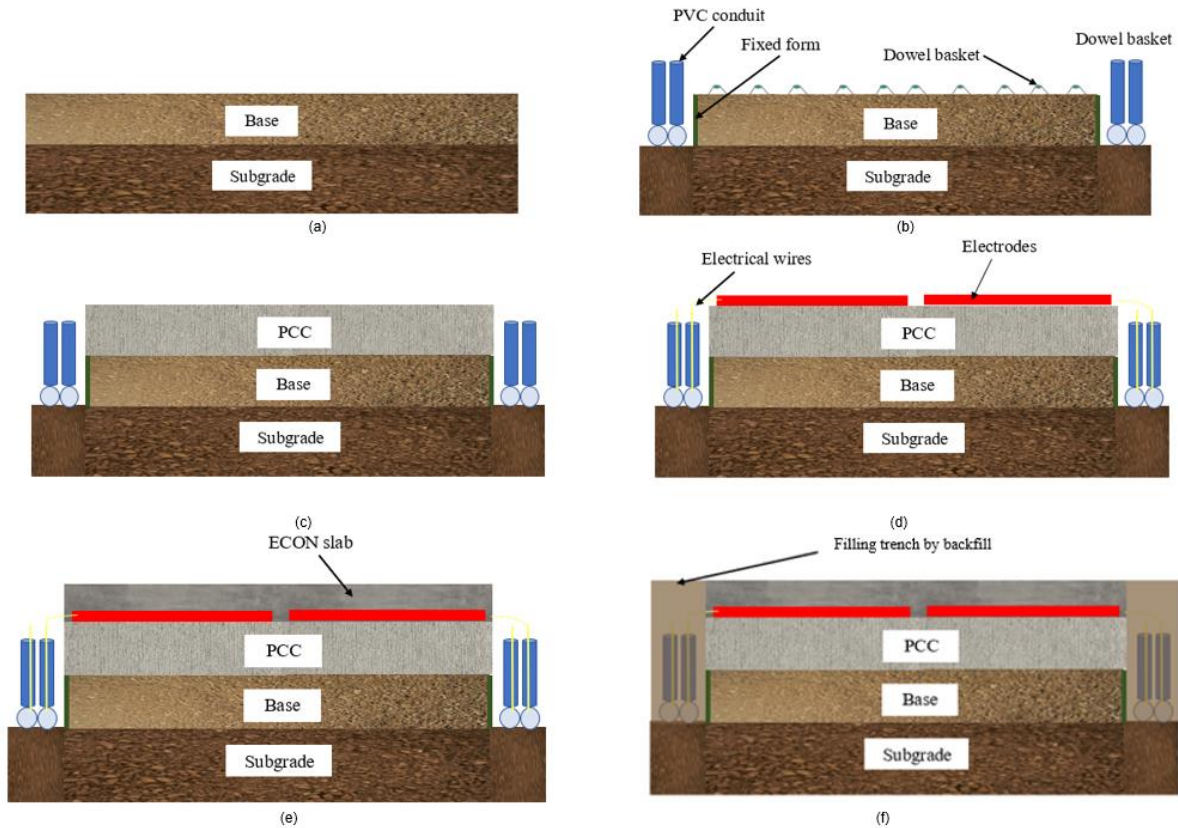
Construction steps of ECON HPS: (a) preparation of subgrade and base layer, (b) cutting of trench for placing PVC conduits and placement of dowel baskets, (c) construction of PCC layer, (d) placement of electrodes and wire connections, (e) constructing ECON layer, and (f) backfilling the trench [6]
